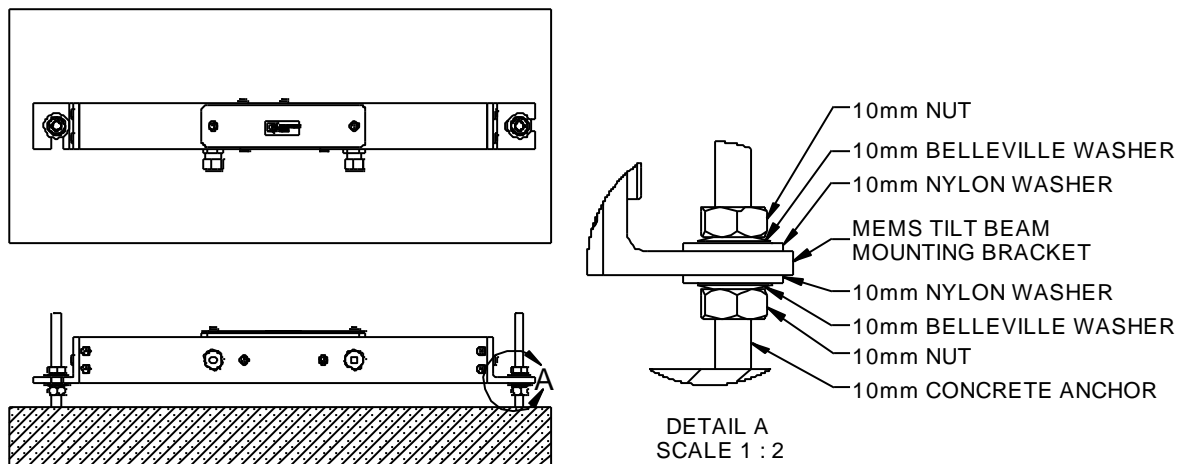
Horizontal & Vertical Tilt Beam Concrete Anchor Orientation
